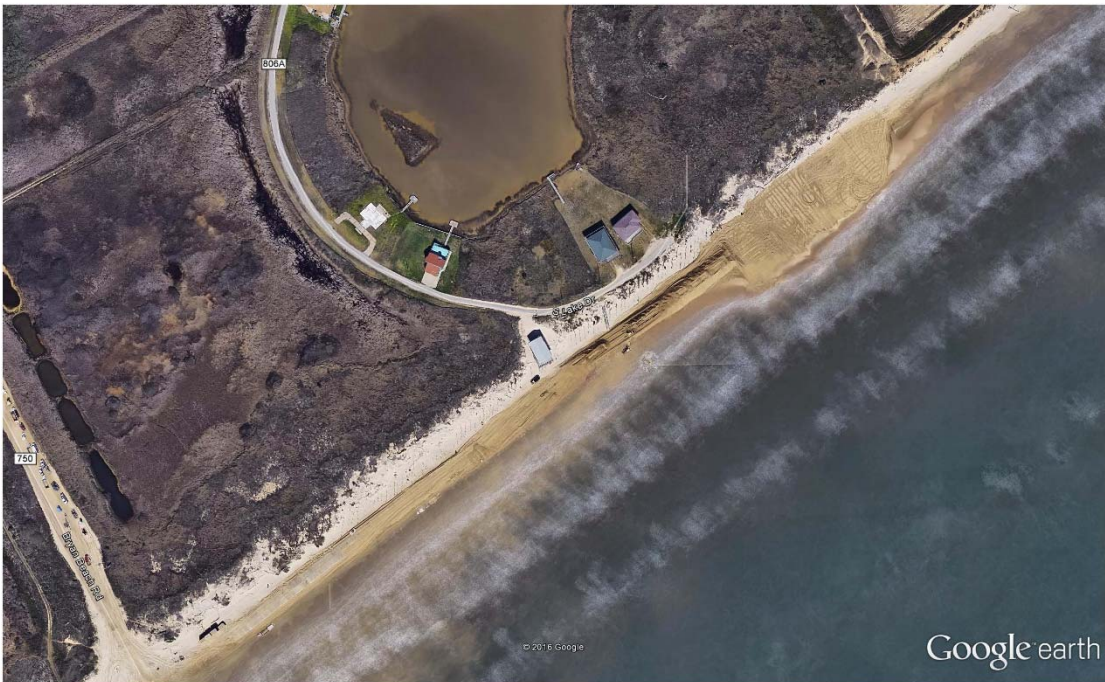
Bryan Beach during Construction (2016; Photo provided by Google Earth)
